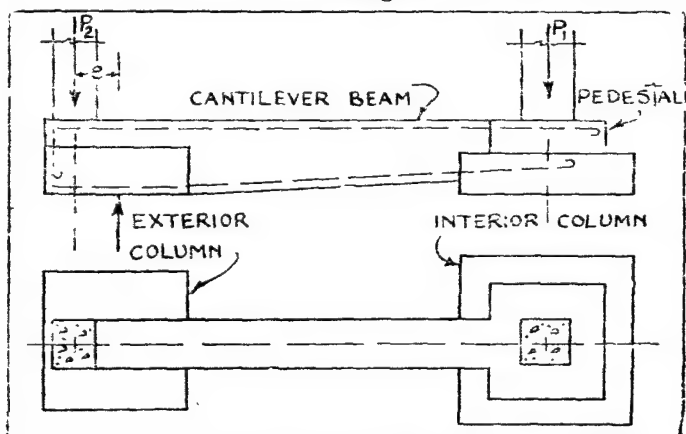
Cantilever spread footings. Fig. 20. Plan of the above.
